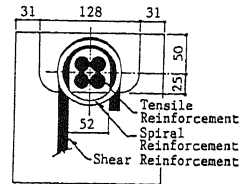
Detail of Spiral Reinforcement and Lap Splice
